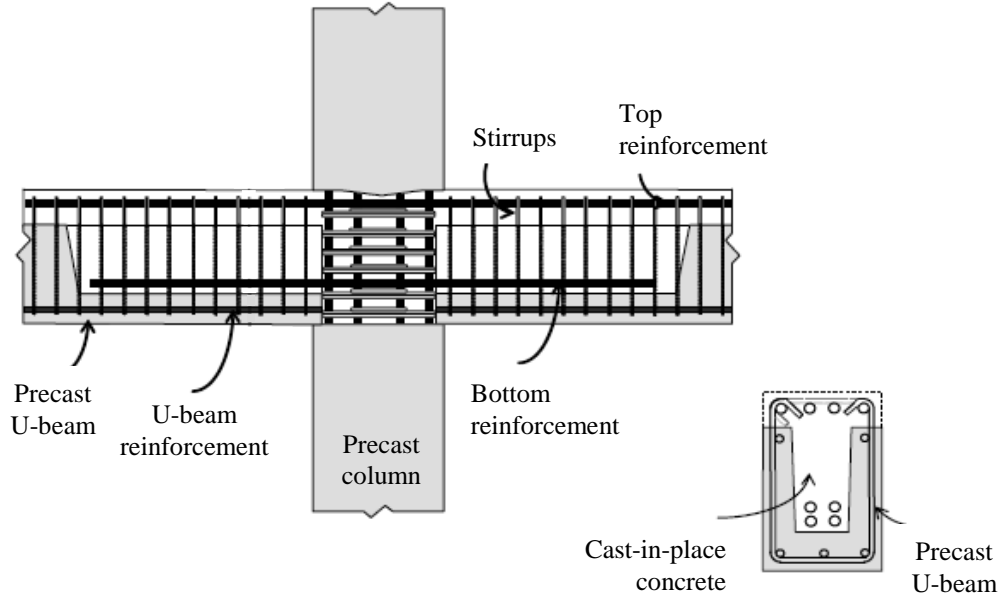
U-beam detail for precast frames proposed by Lee et al. [37] (adapted from [37]).
